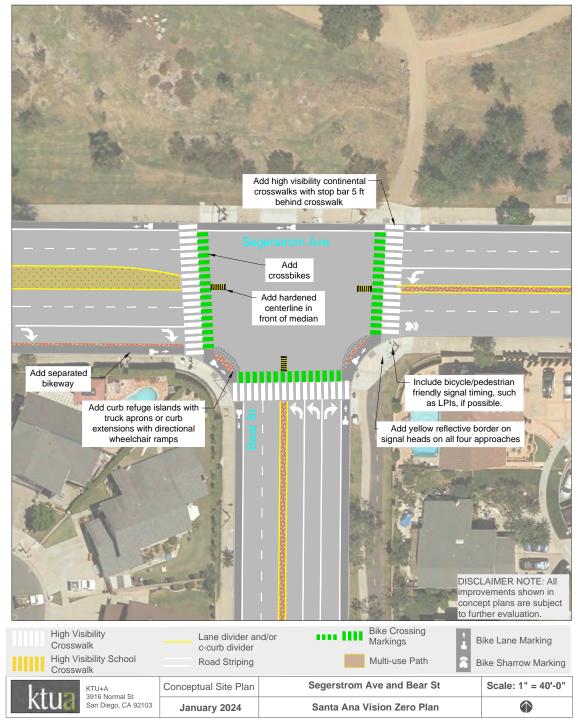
Segerstrom Avenue and Bear Street Recommendations
